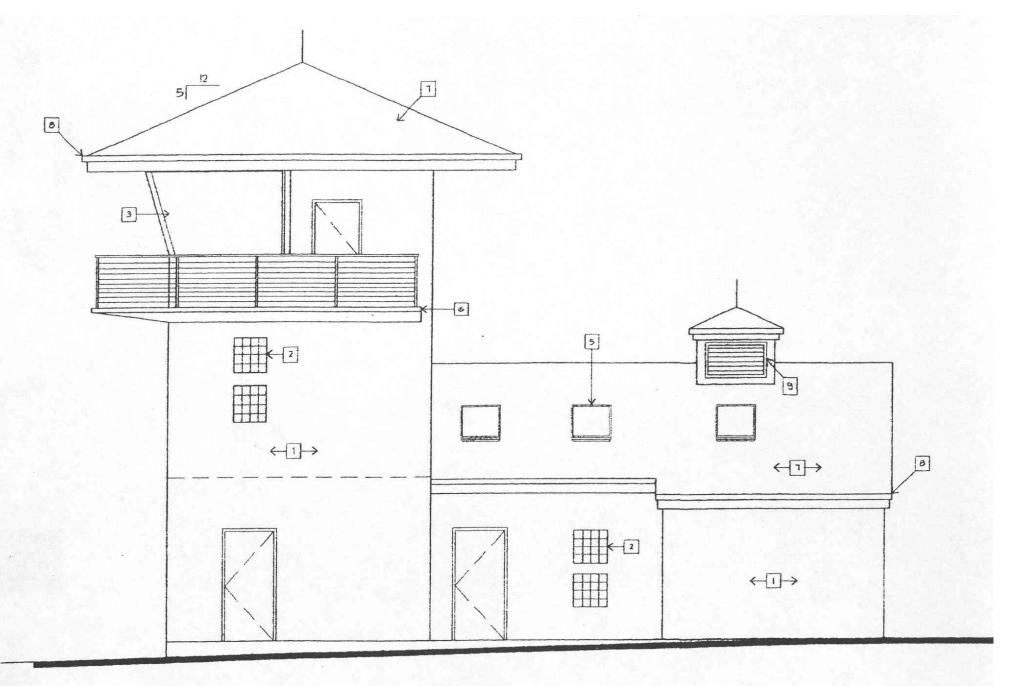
A-4-VNT-08-057 / A-4-VNT-08-100 Elevations
